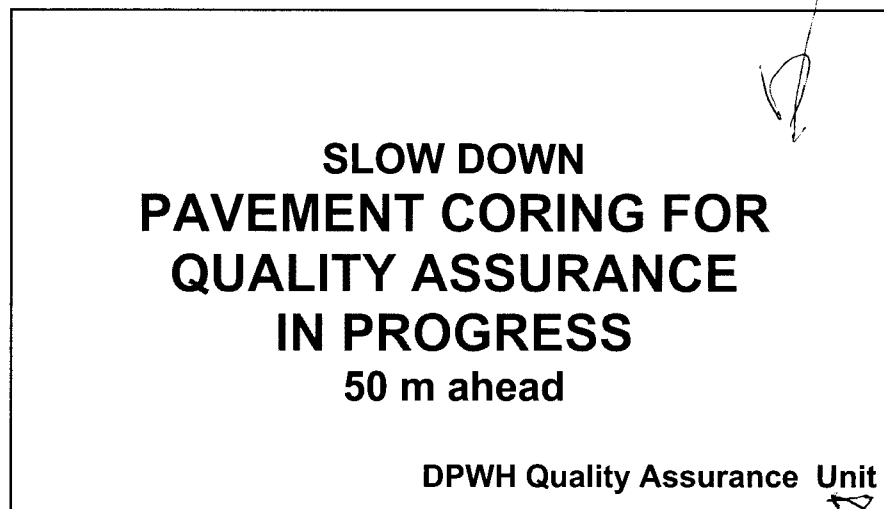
To be used during the conduct of coring for thickness and strength determination of concrete and asphalt pavements
